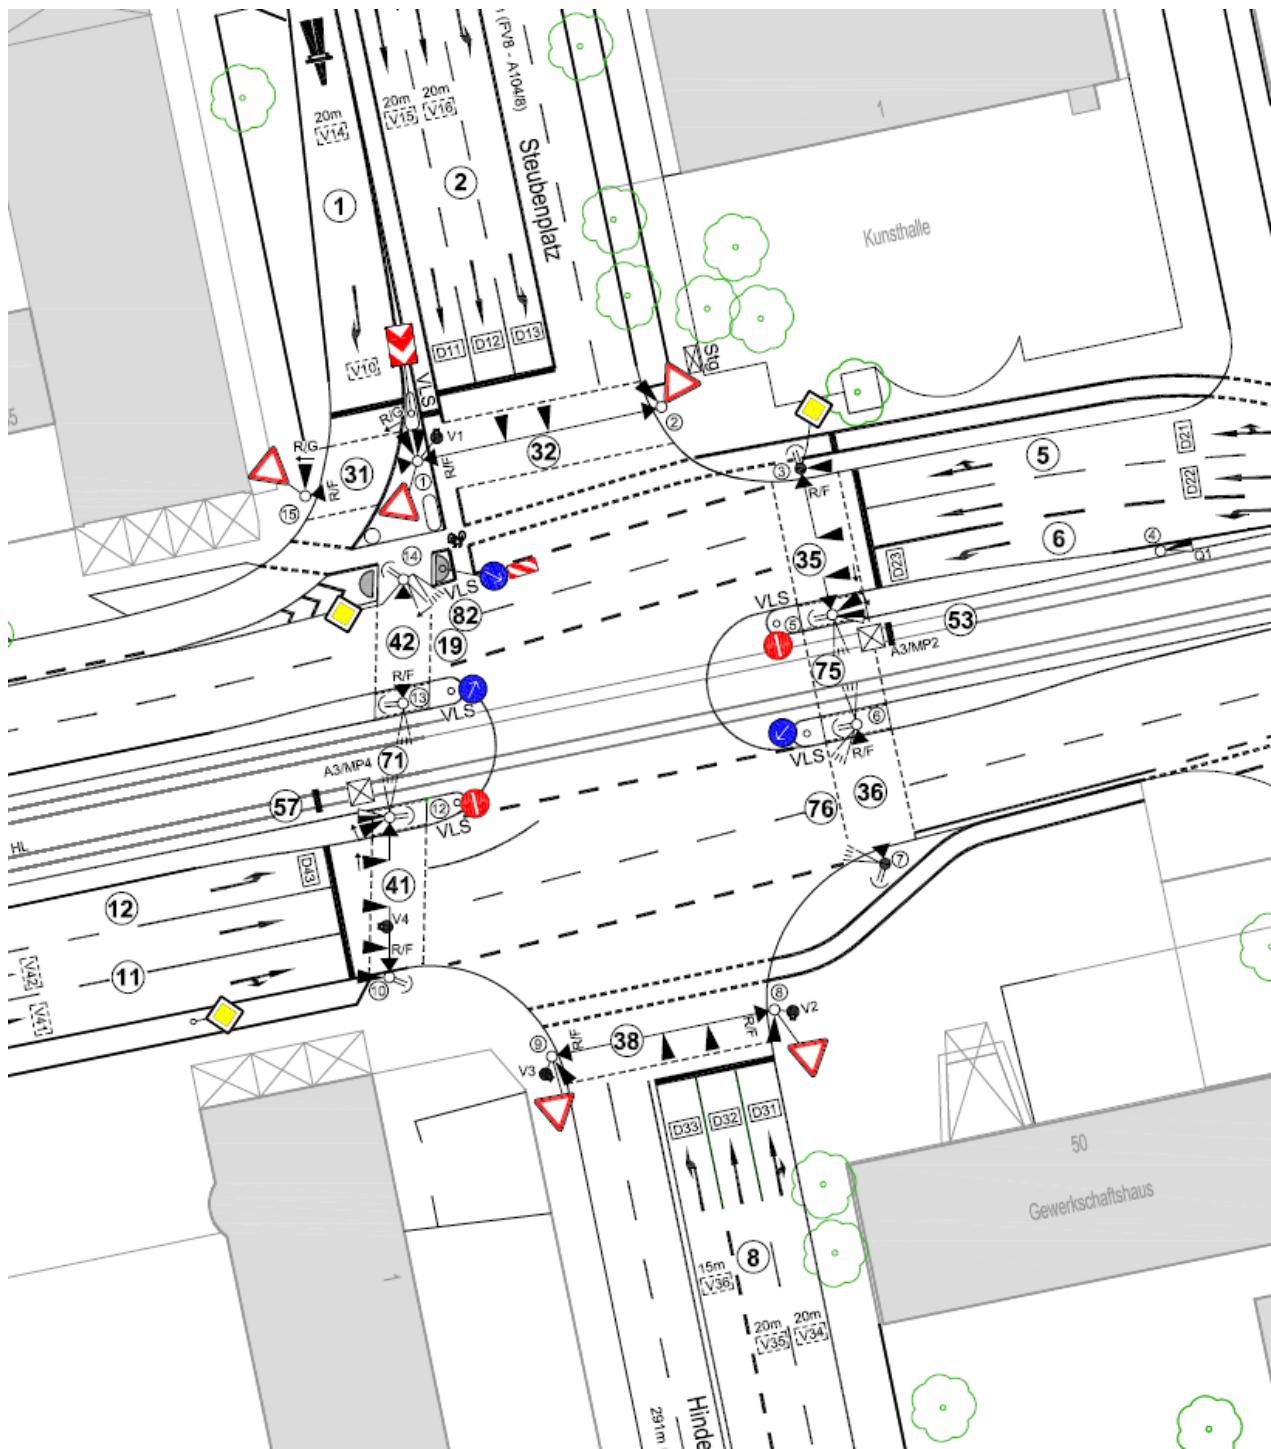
Junction layout of A3 Intersection, Darmstadt (Source: Darmstadt Town hall)
